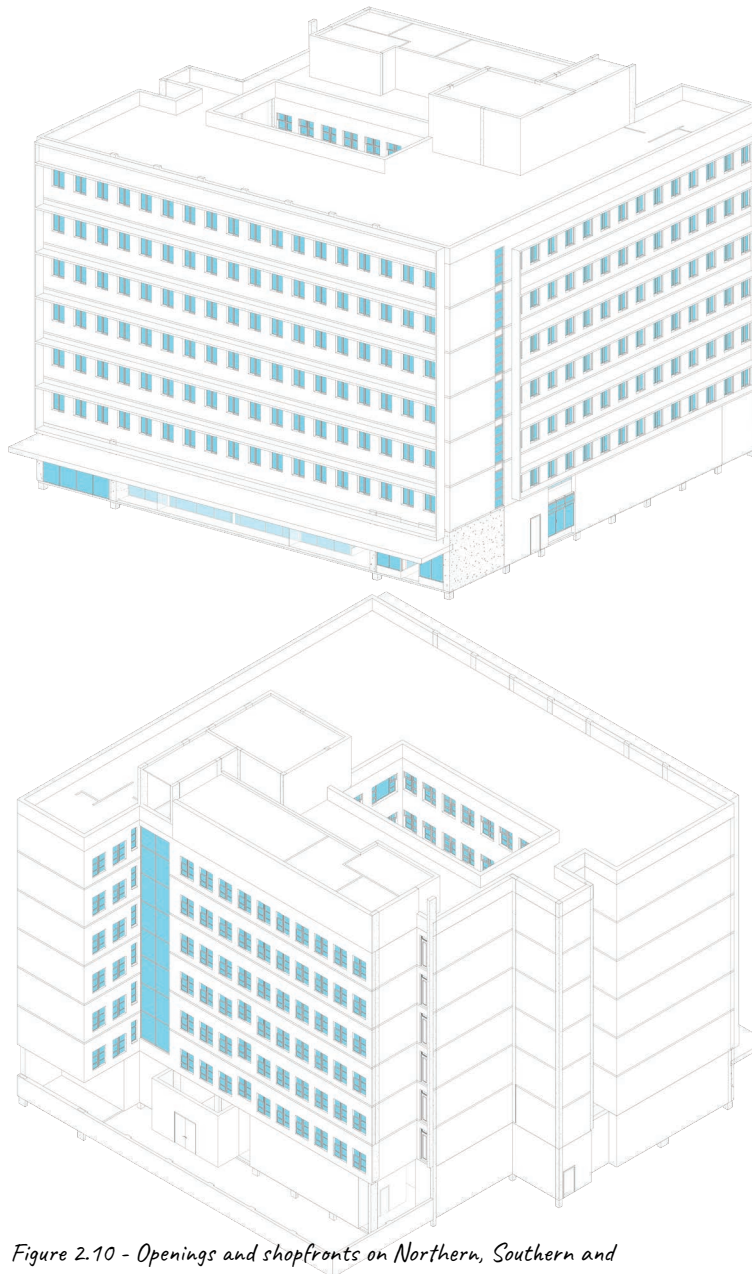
Openings and shopfronts on Northern, Southern and Western facades
